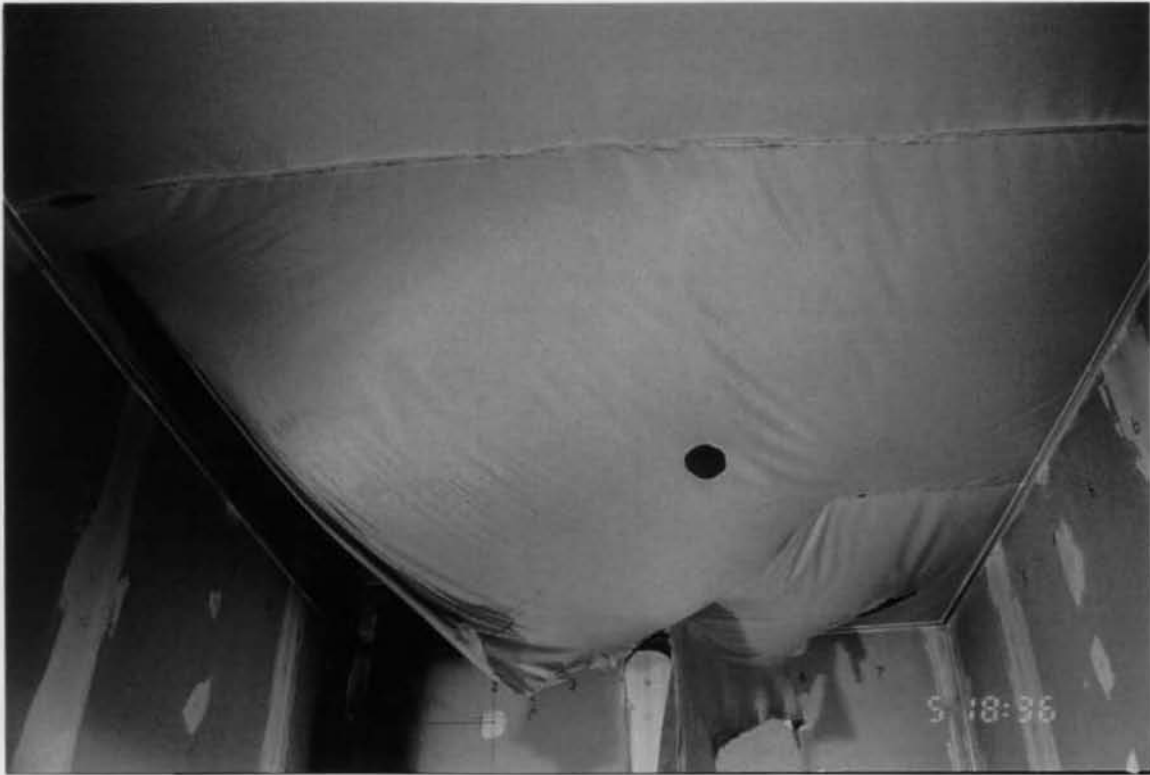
Reinforced PVC Membrane Ceiling at End of 15-Min Fire Exposure. Membrane Has Torn from Angle Trim 8 Ft Along both Walls.
